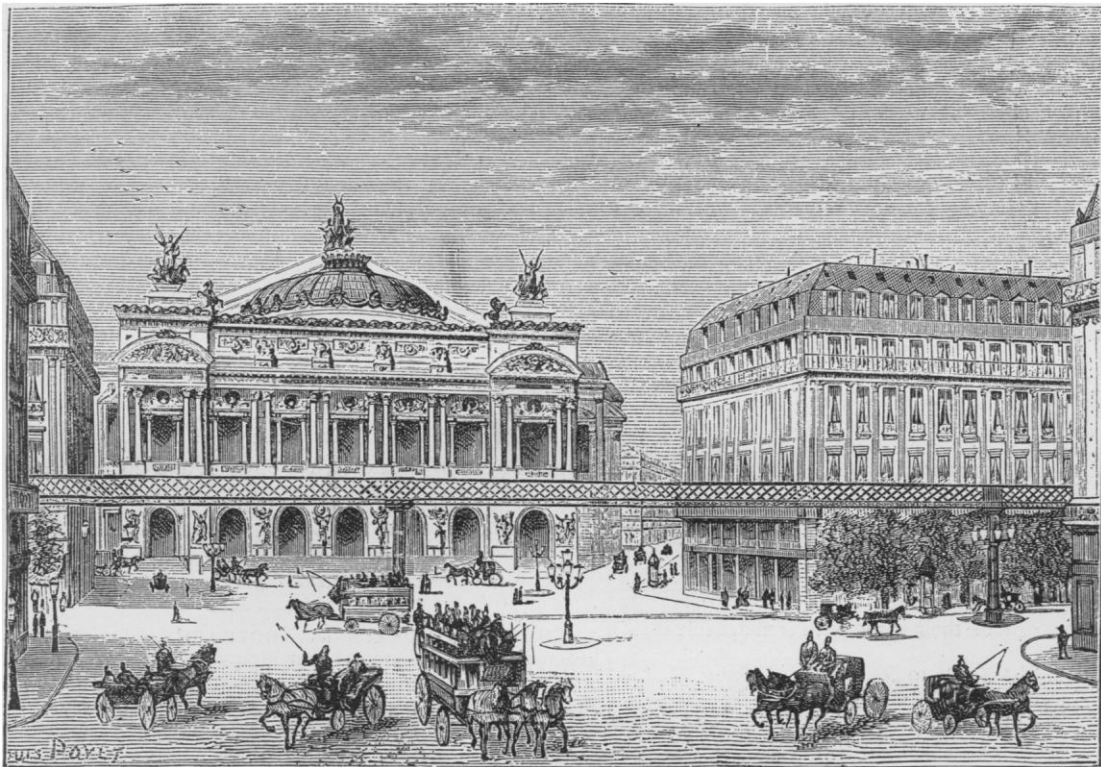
PLAN OF THE ELECTRIC ELEVATED ROAD. VIEW BEFORE THE GRAND OPERA OF PARIS.
